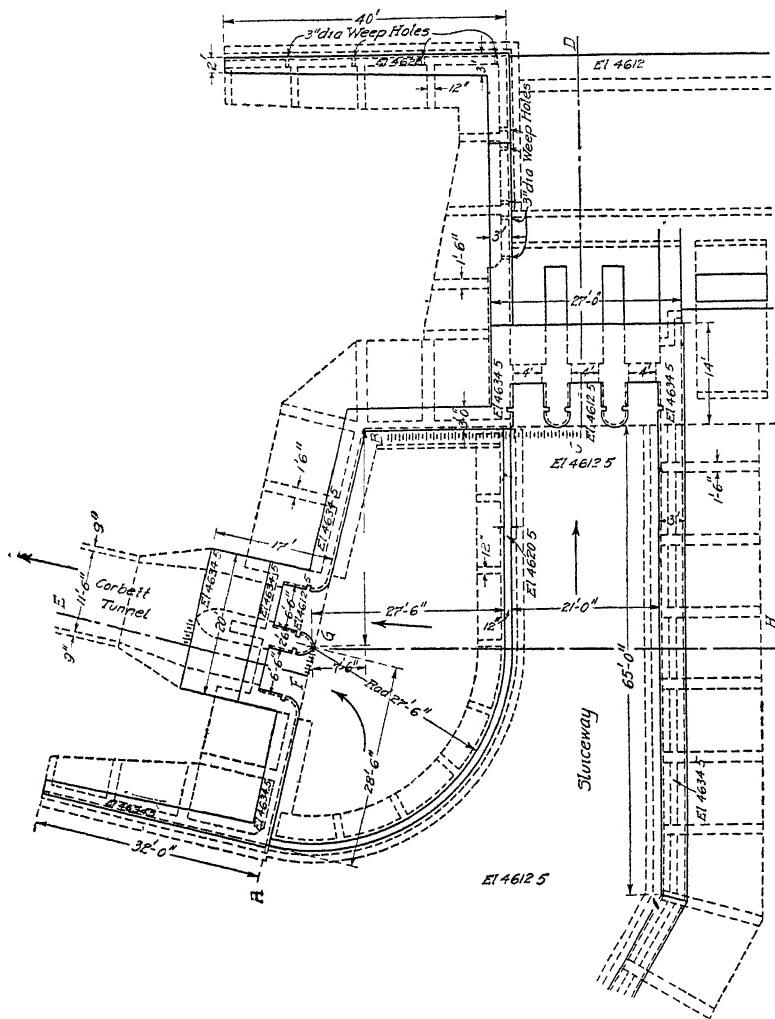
Plan of Weir Sluices for Corbett Dam on Shoshone River, Wyoming
